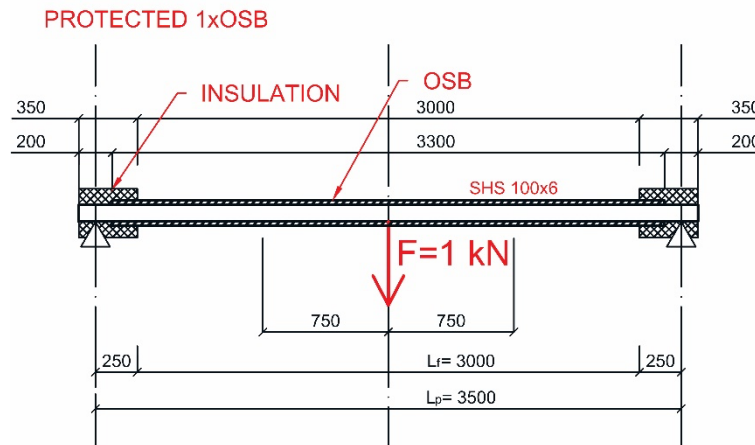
Static scheme of steel beam protected OSB cladding thickness 22 mm.
